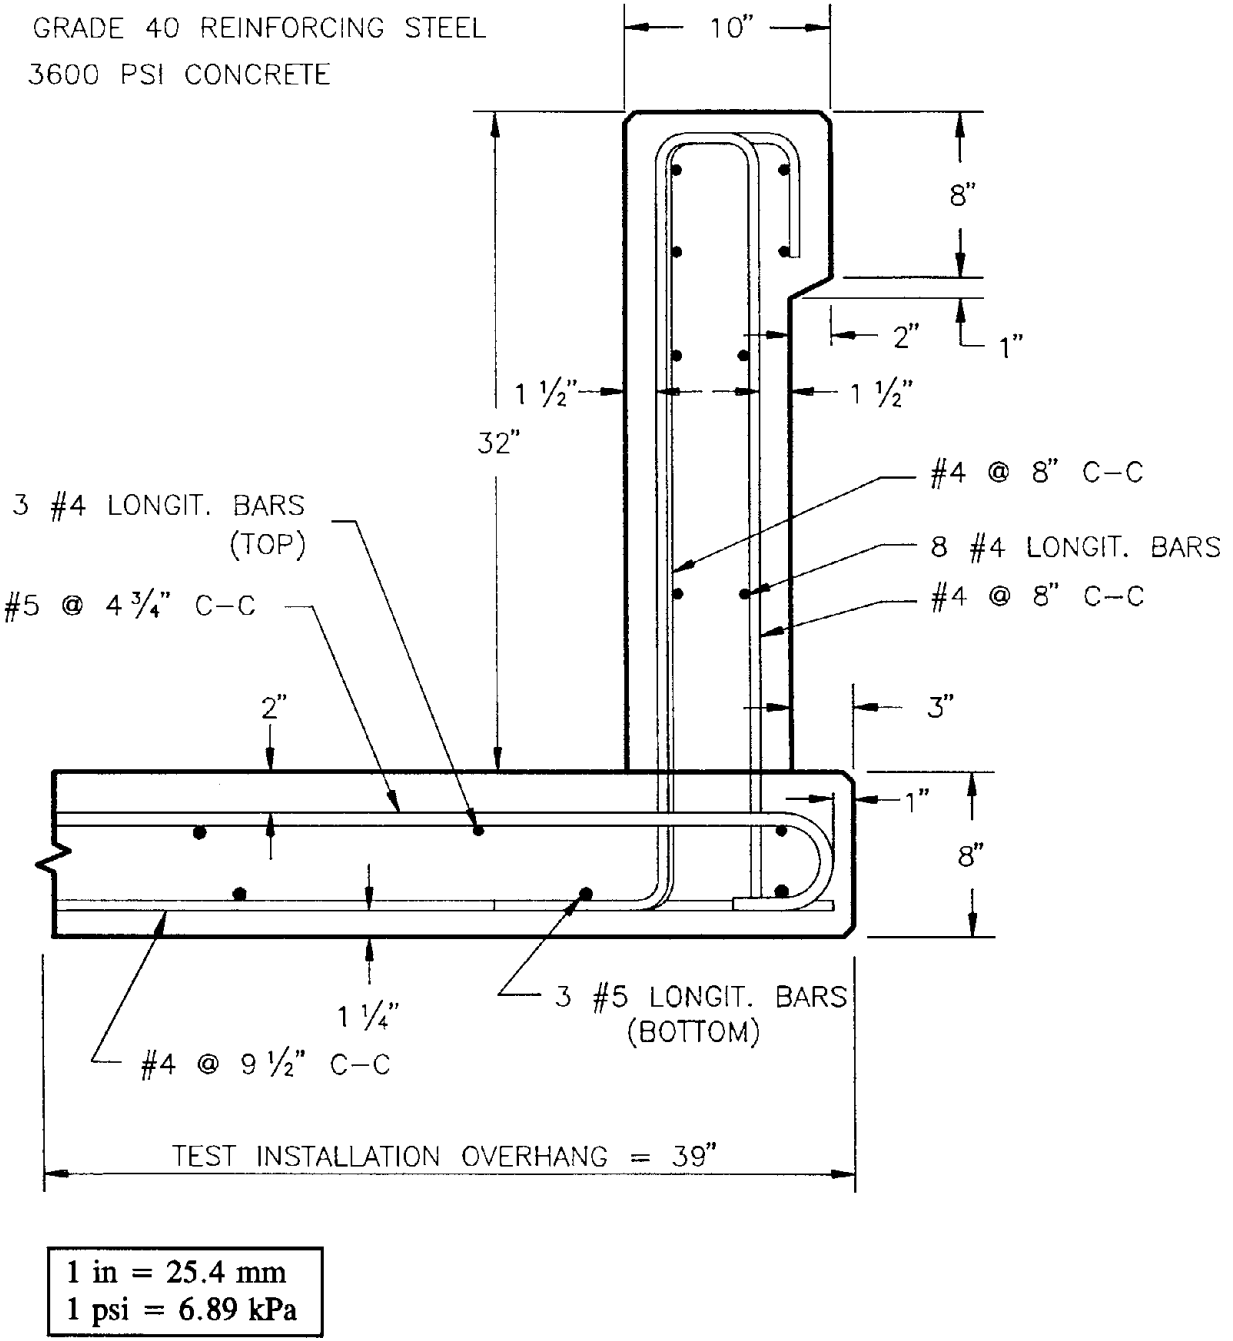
Cross section of 32-in (813-mm) concrete parapet.
